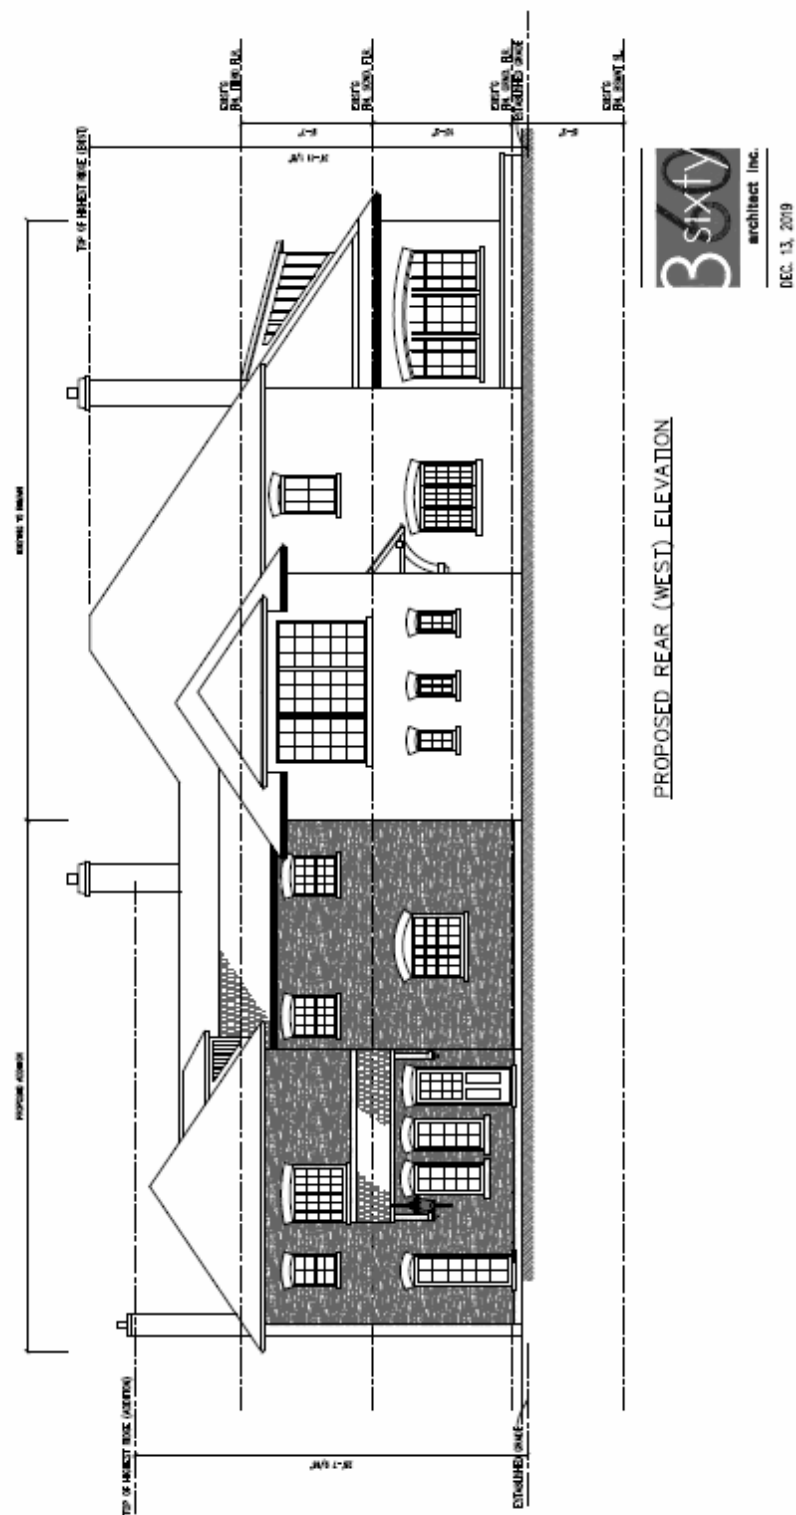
The rear or west elevation of 1341 Stavebank Road with proposed addition.
